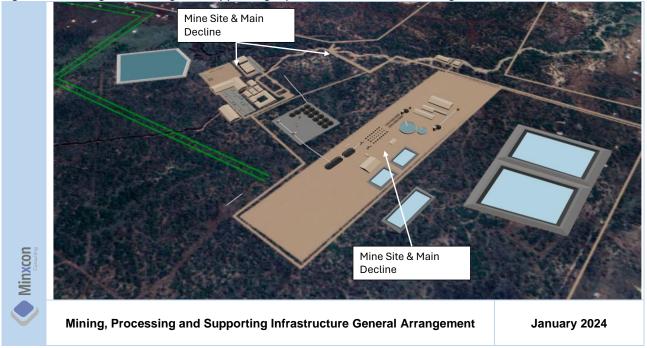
Mining, Processing and Supporting Infrastructure General Arrangement
